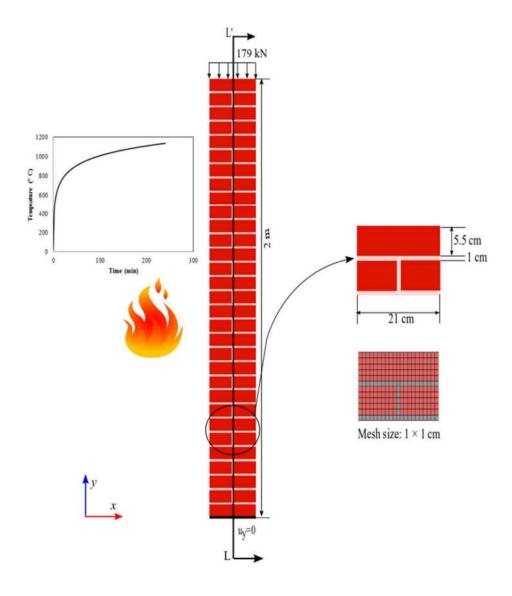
Full-scale masonry wall subjected to standard fire exposure.
